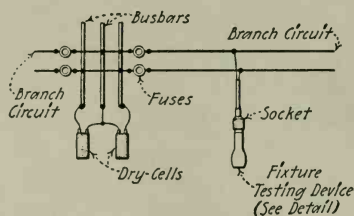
Method of using the fixture-testing device to locate open-circuits before the service connection has been made.
